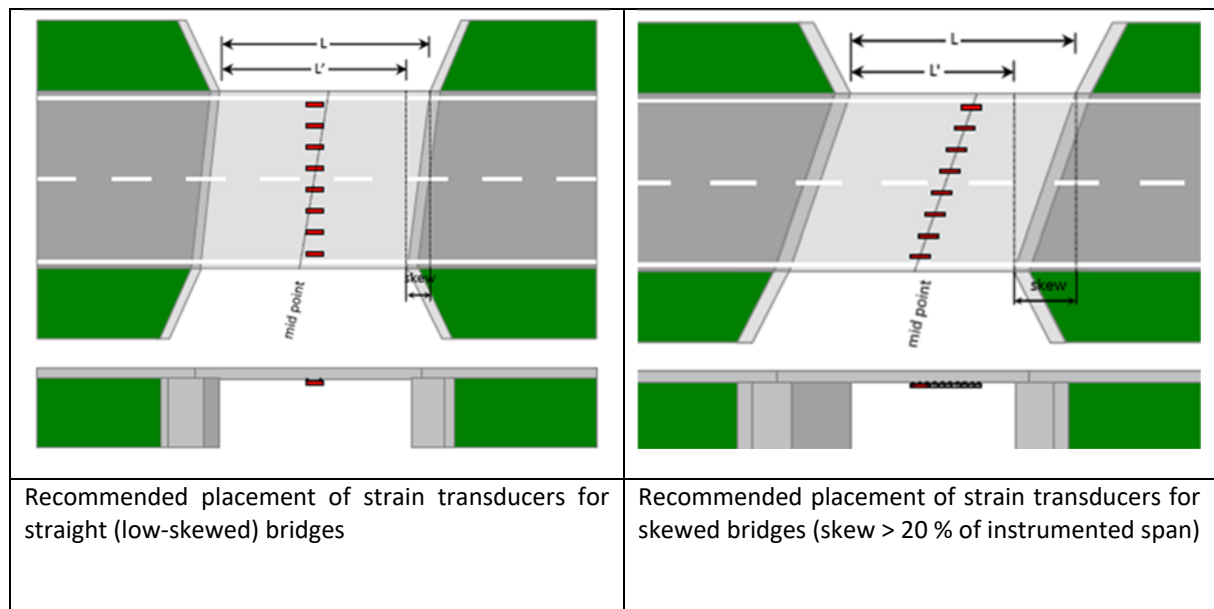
Recommended placements of strain transducers for straight and skewed bridges.
